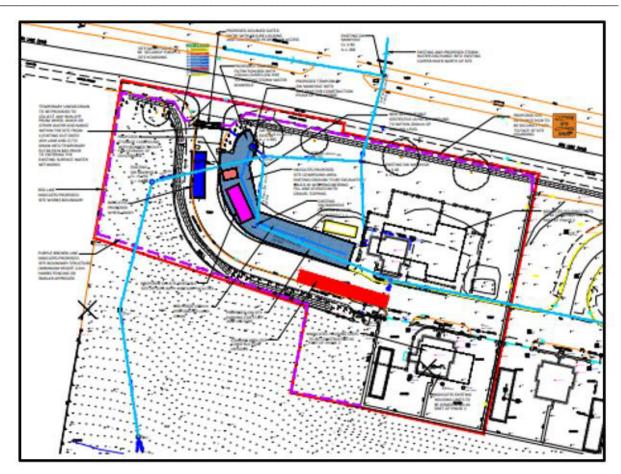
Surface Water Disposal during construction at Ash Lane (Technical Drawings, Appendix I)
